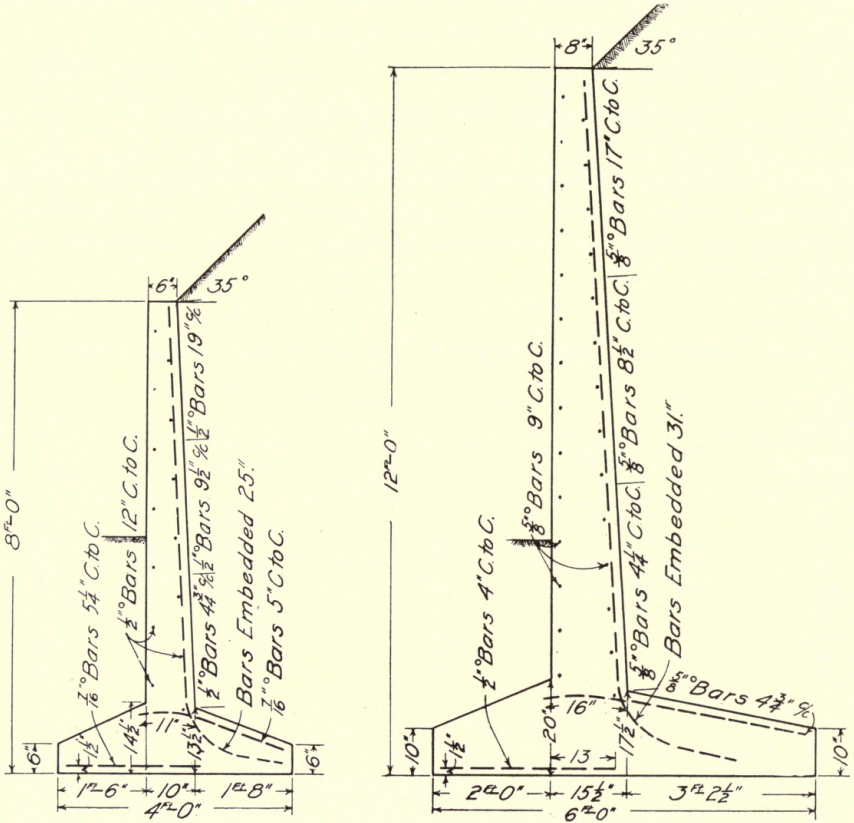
SECTIONS FOR REINFORCED RETAINING WALLS.
